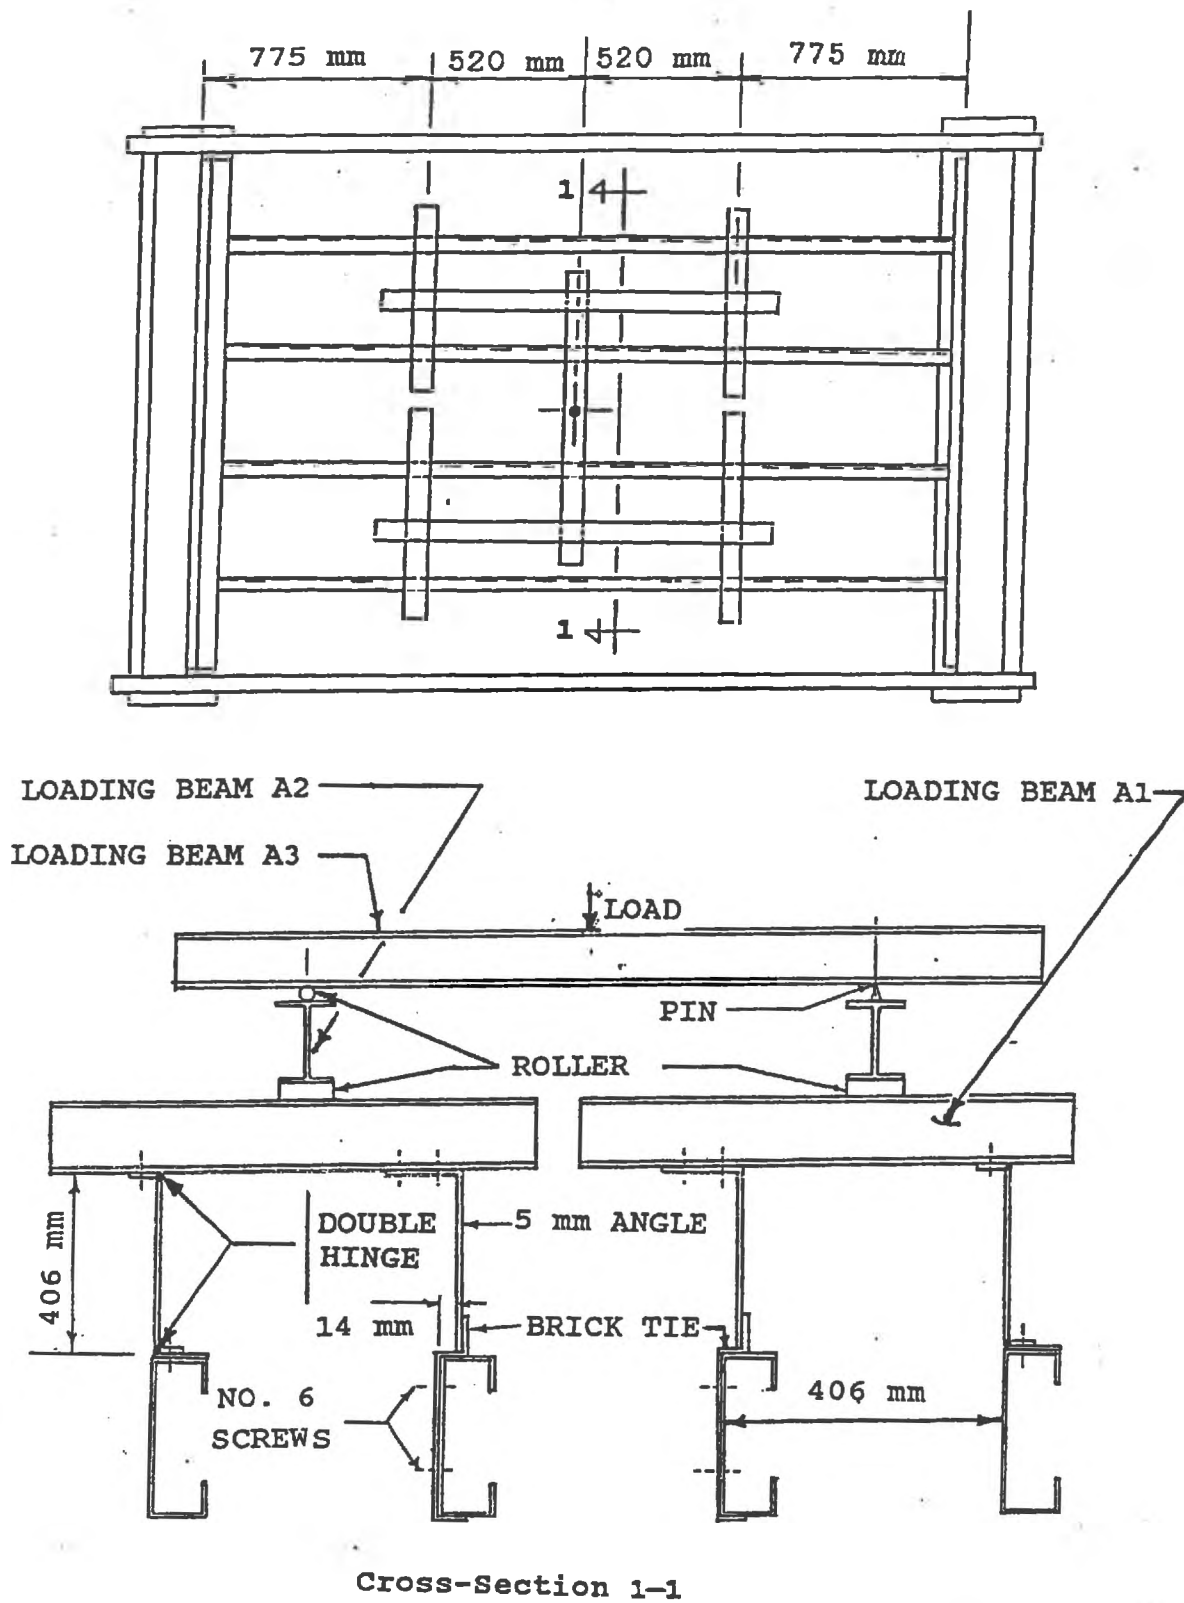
Test Setup for 4 Stud Backup Wall Specimen
